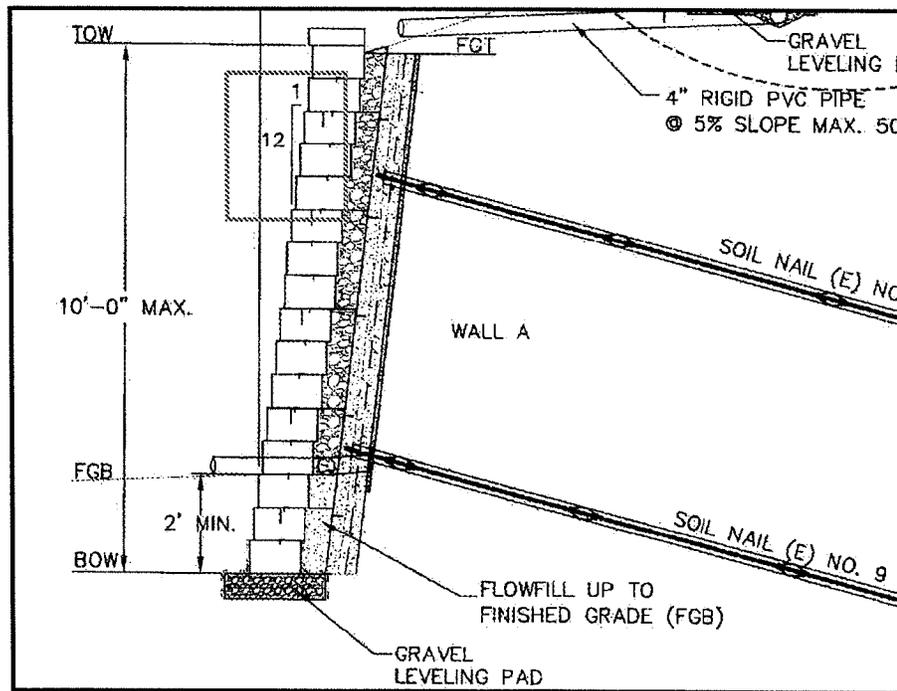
Excerpt from sheet W14-8 from Ground Engineering design drawings showing soil nail wall cross section; notated with red rectangles to highlight areas discussed above
